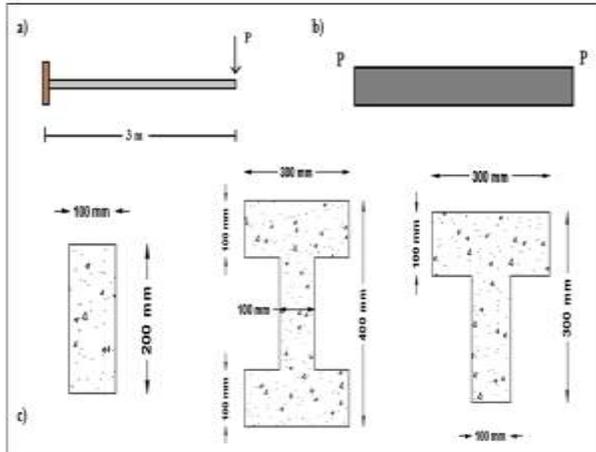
(a) Cantilever; (b) shear force diagram; (C) Cross-section areas
